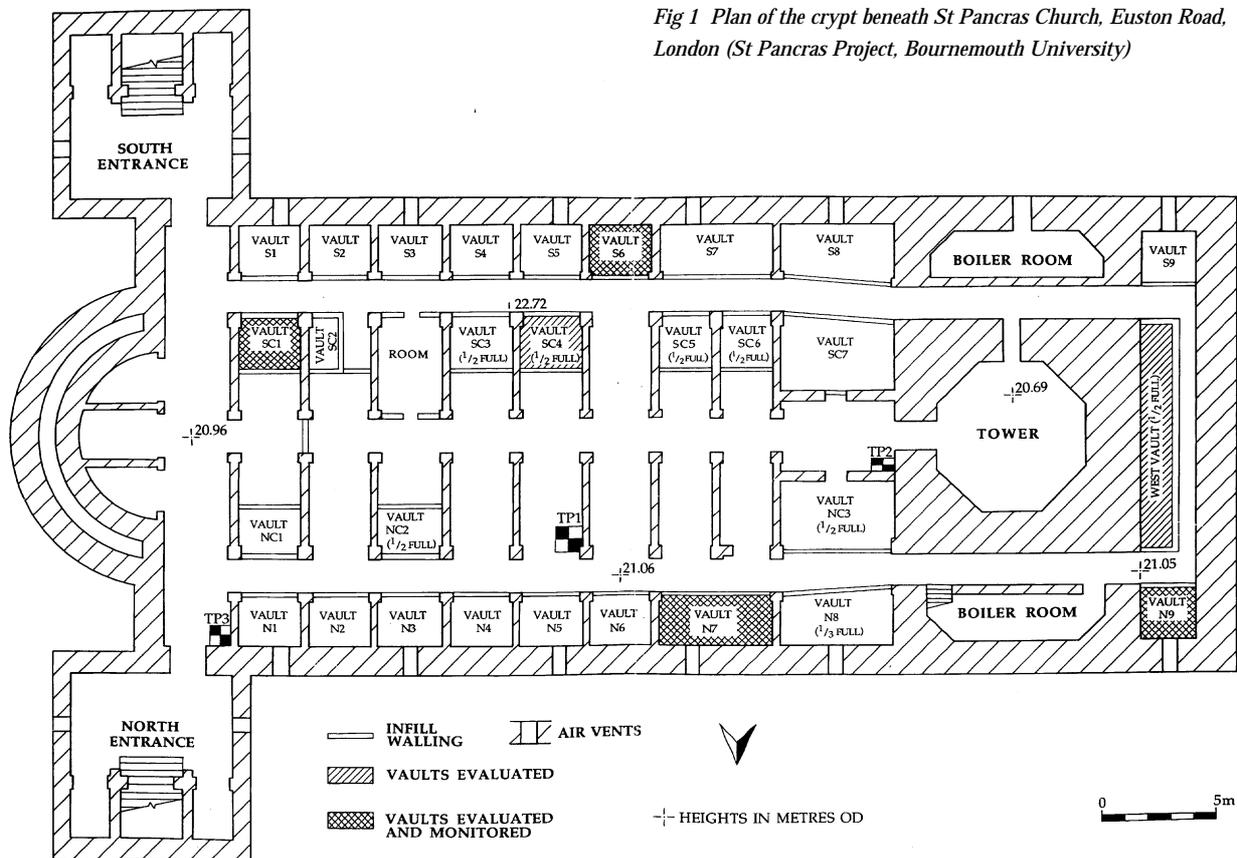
Plan of the crypt beneath St Pancras Church, Euston Road, London (St Pancras Project, Bournemouth University)
